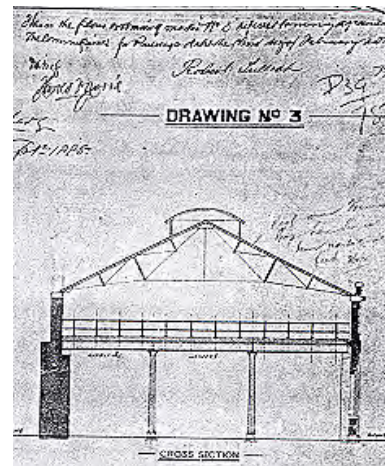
Detail from the original drawing entitled 'New Workshops Eveleigh. Columns, Cranes and Flooring Girders'. The note to the right of the section reads "Roof over Trimming Shop has since been raised several feet" and appears to be dated 1912. Source: SRA Archives Drawing 39-75.
